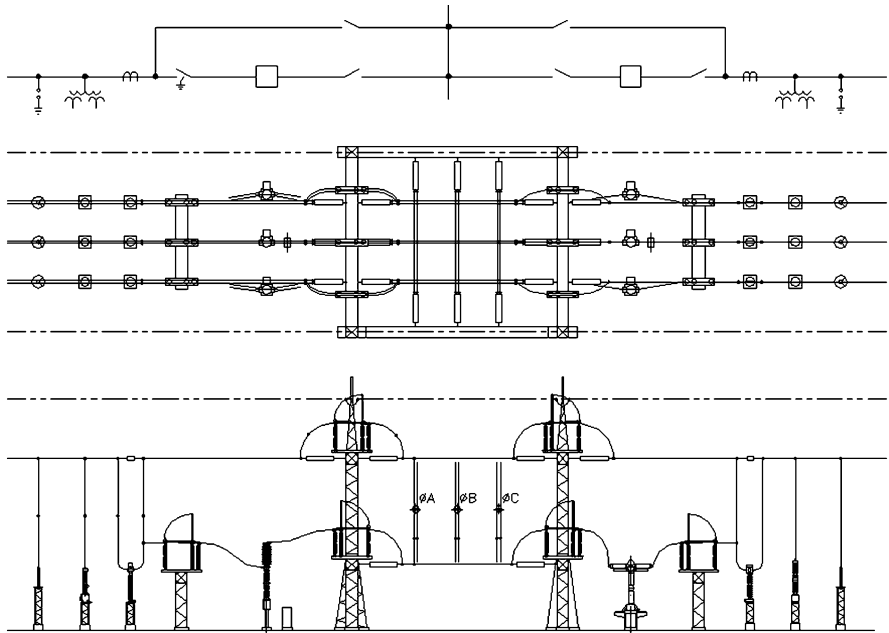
Single busbar with bypass (plan view and elevation)
